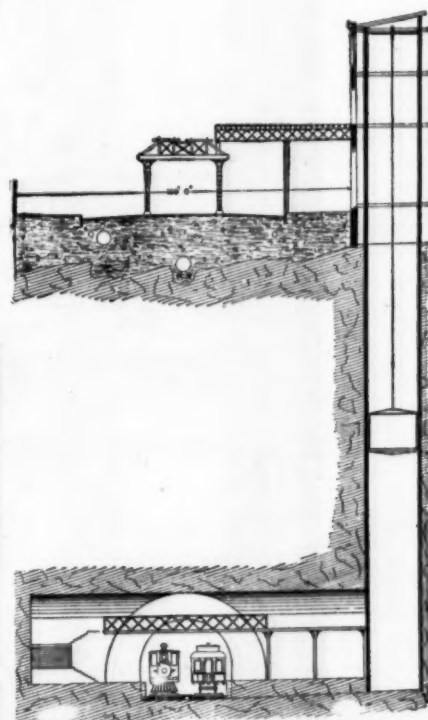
SKETCH SHOWING UNDERGROUND STATION AND ELEVATOR.
